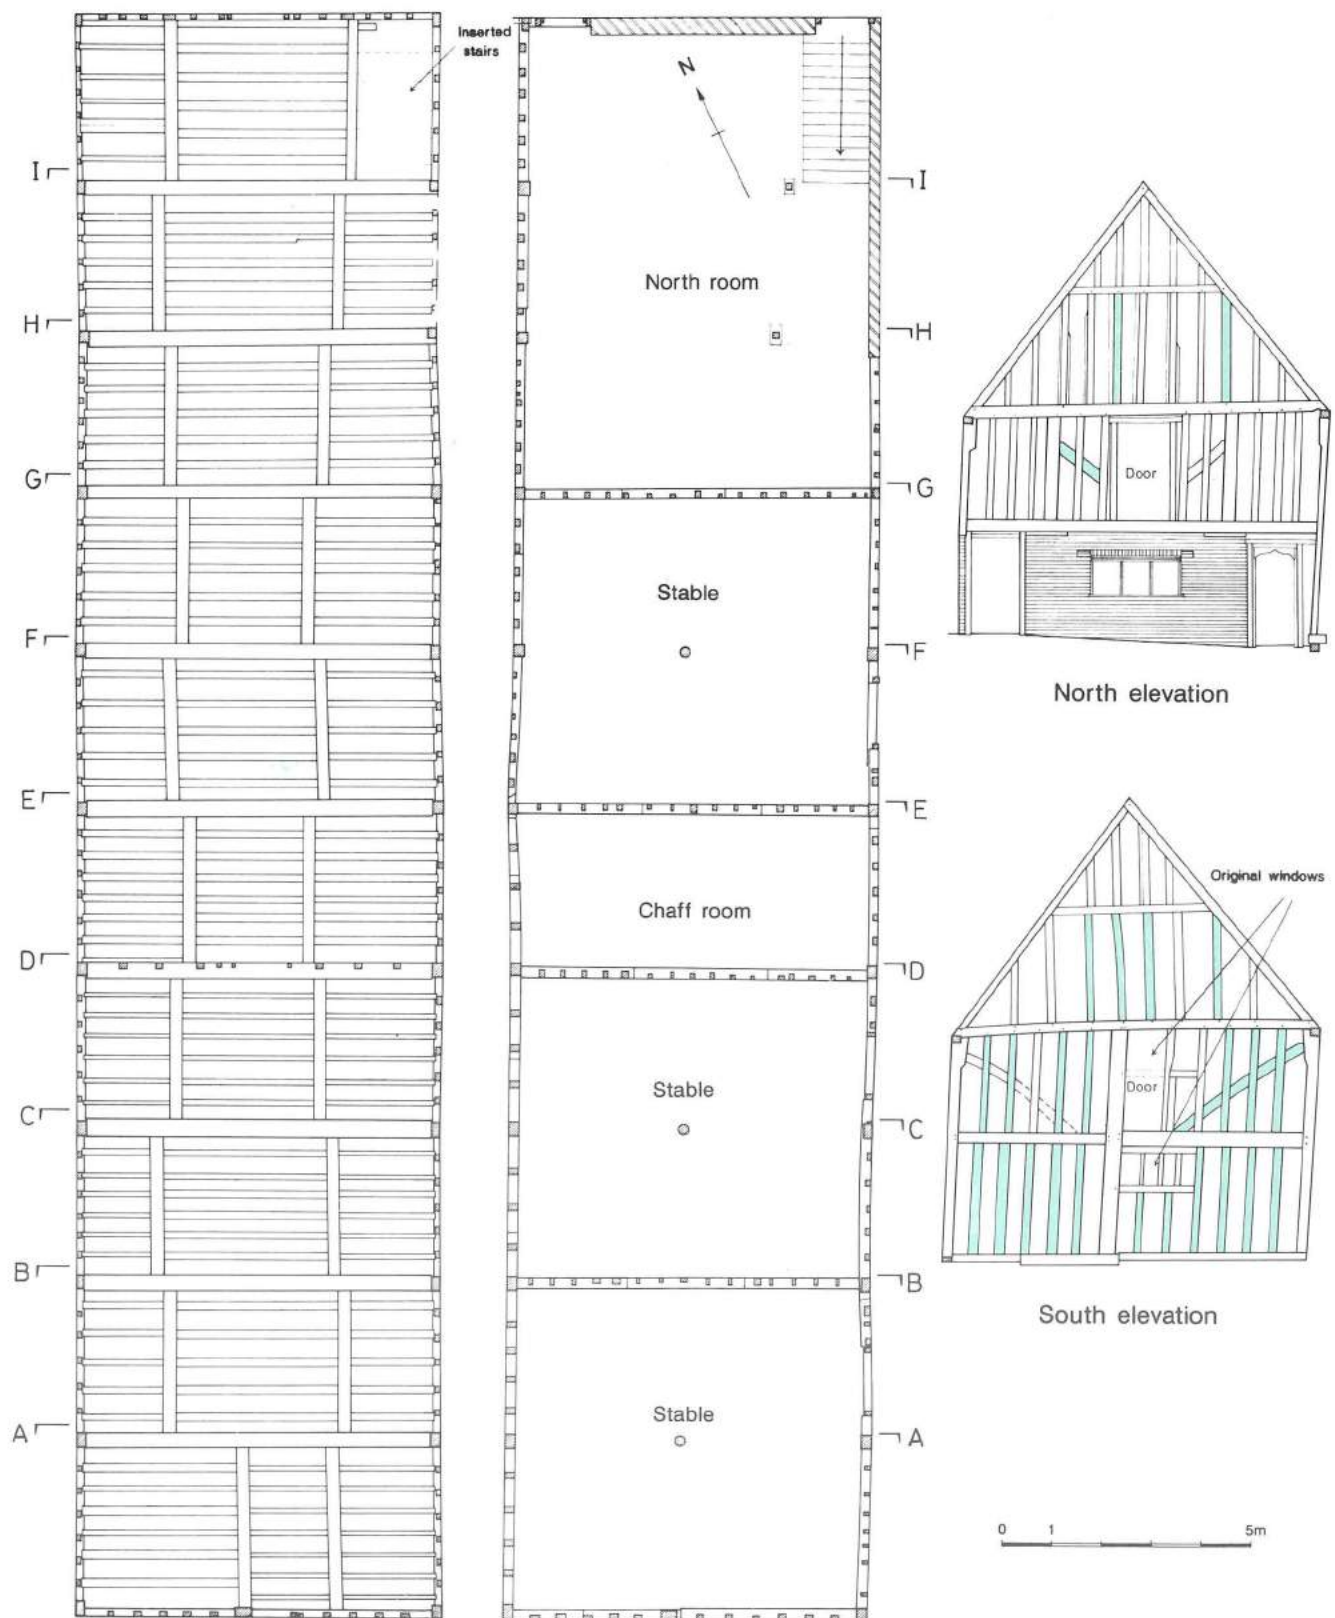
The Granary; floor plans and north and south ends (re-used timbers original to the 1623 construction shaded).
